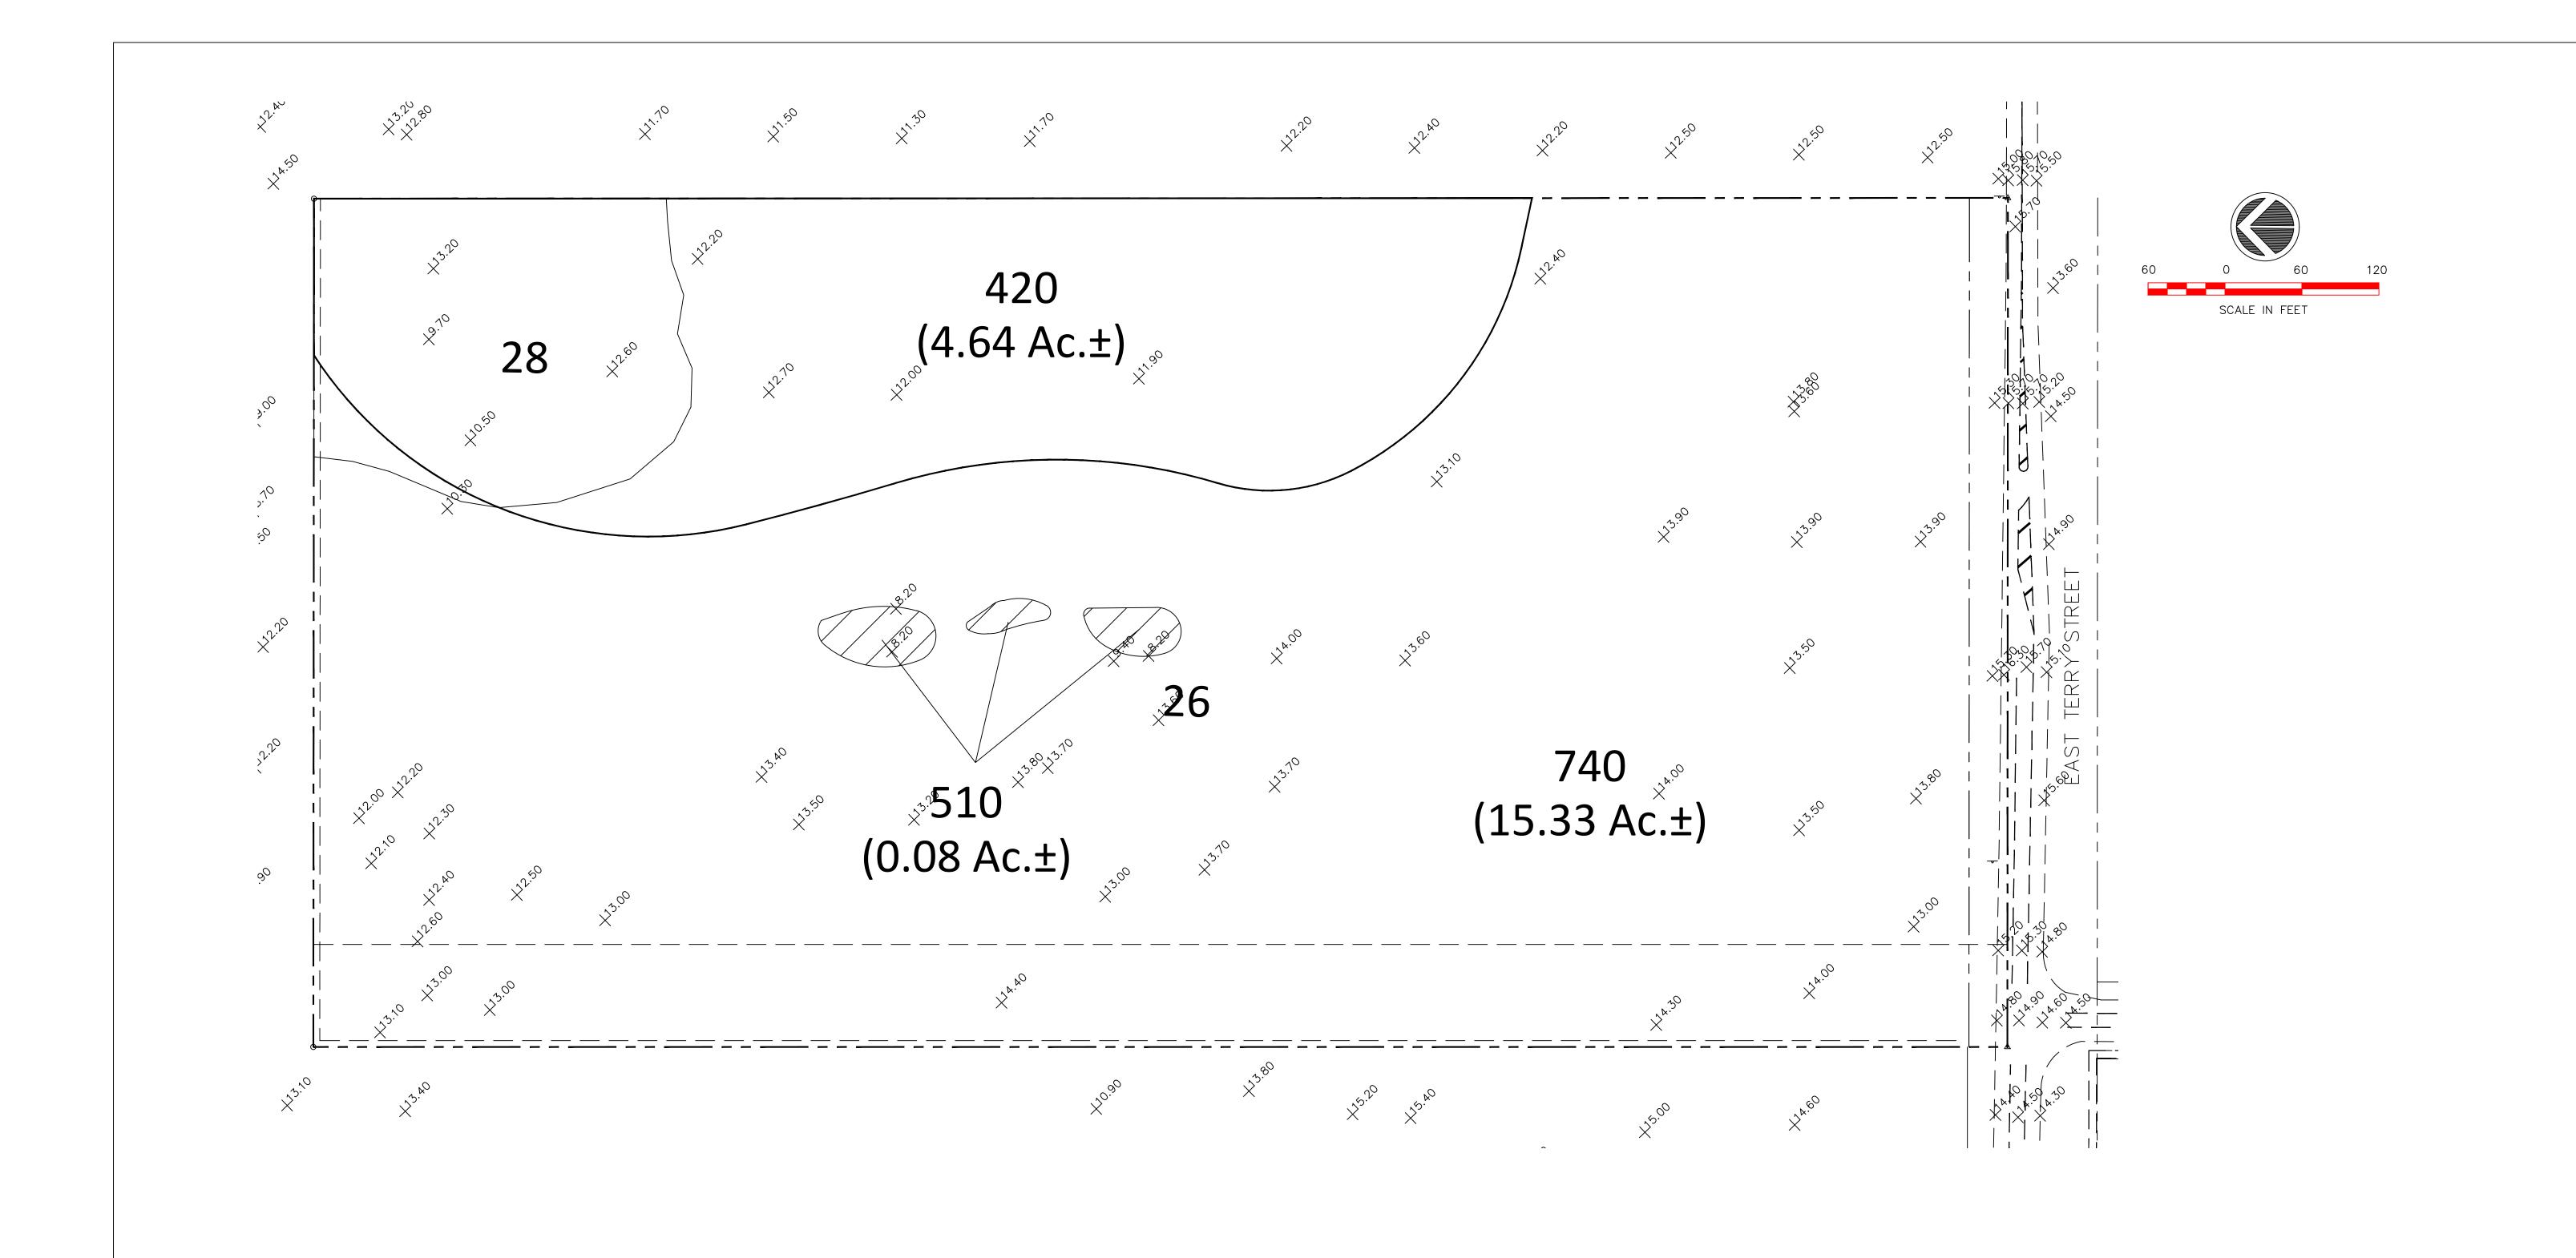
### EXHIBIT IV-E – MASTER CONCEPT PLAN
